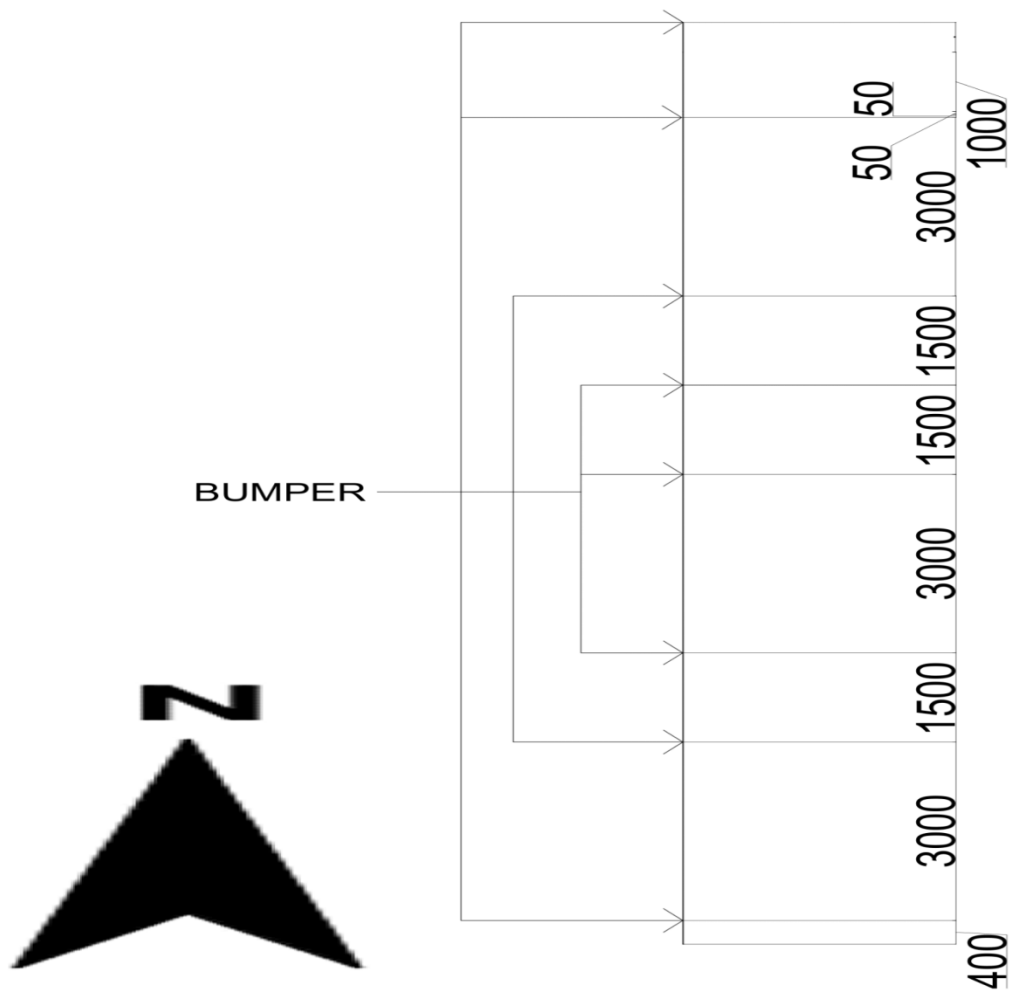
(o): Approximate architectural urban road layout design of the chosen bituminous asphalt road (scale=1:2500)
